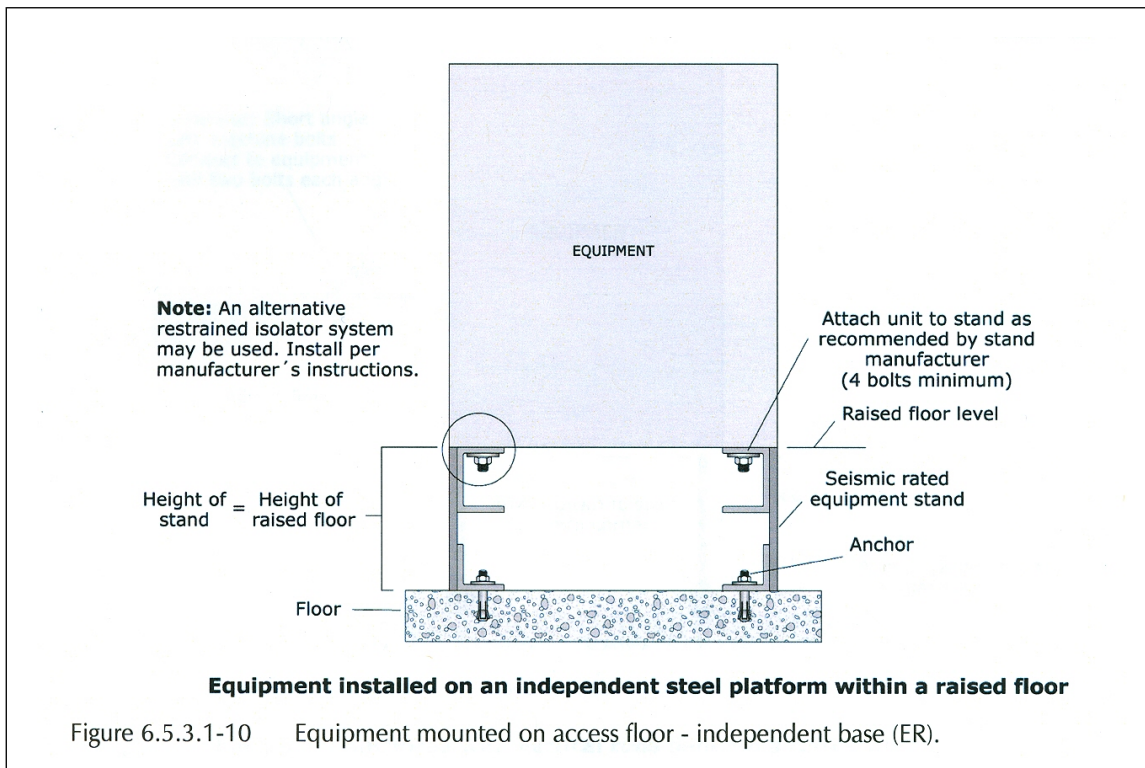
A. Example of equipment on raised access floor but supported on structural floor (Figure 6.5.3.1-10 from FEMA E-74)
